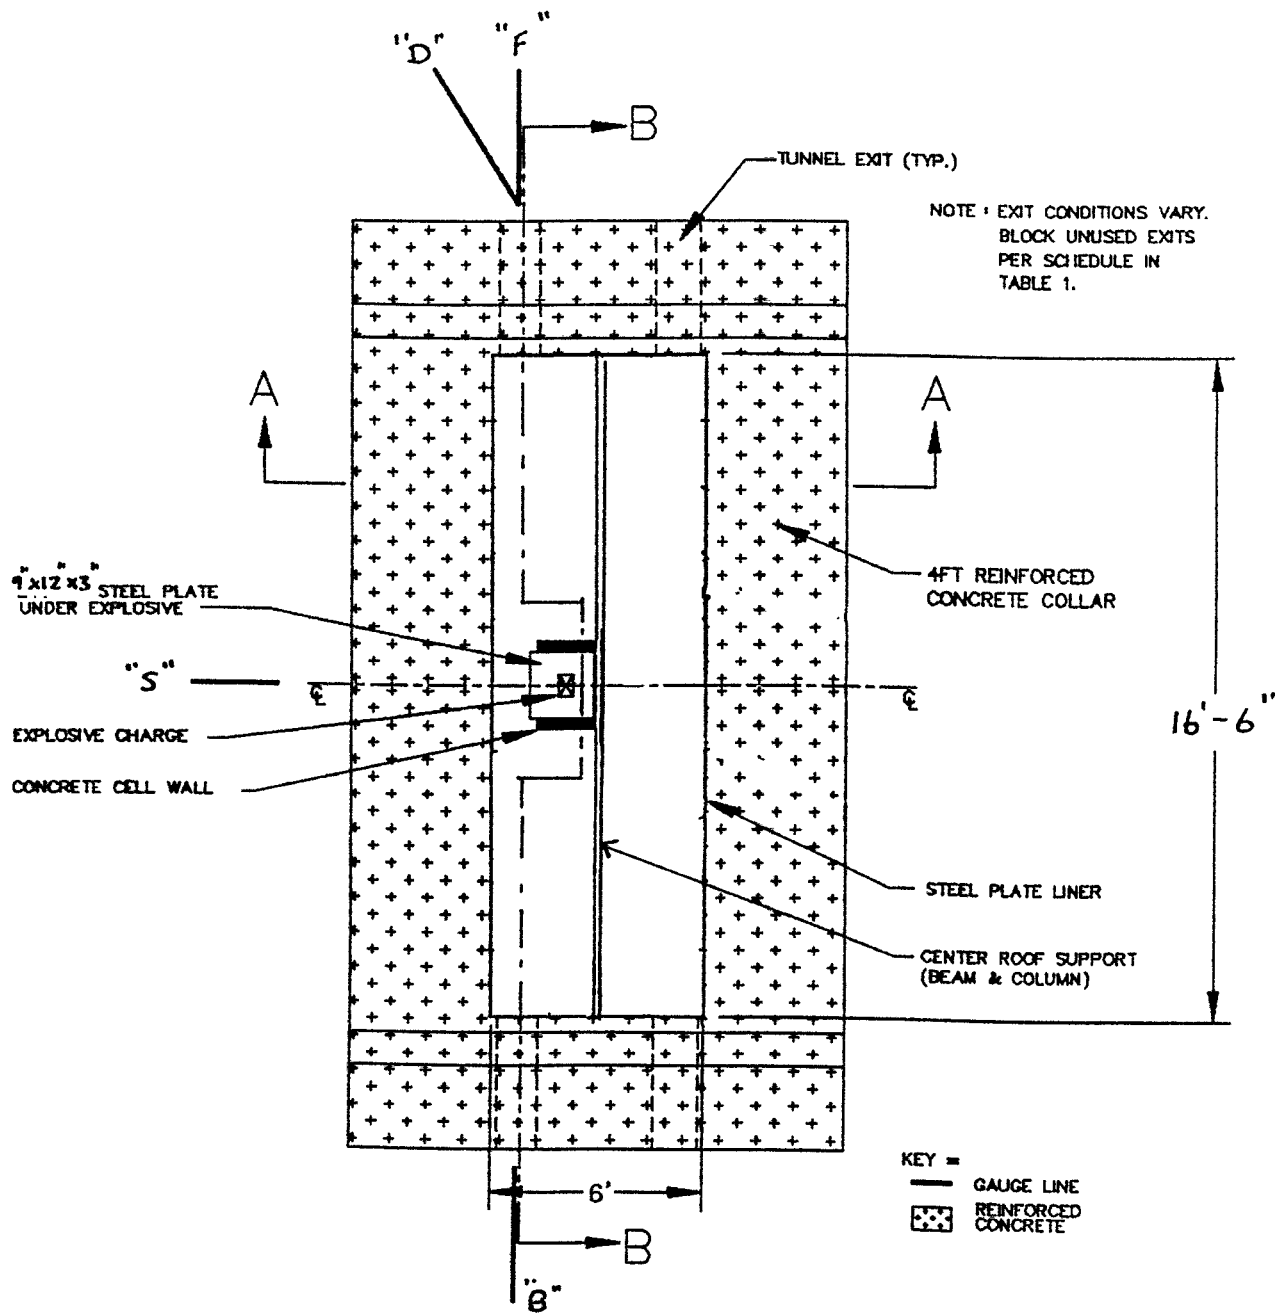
TEST FIXTURE : PLAN VIEW (ROOF NOT SHOWN)
